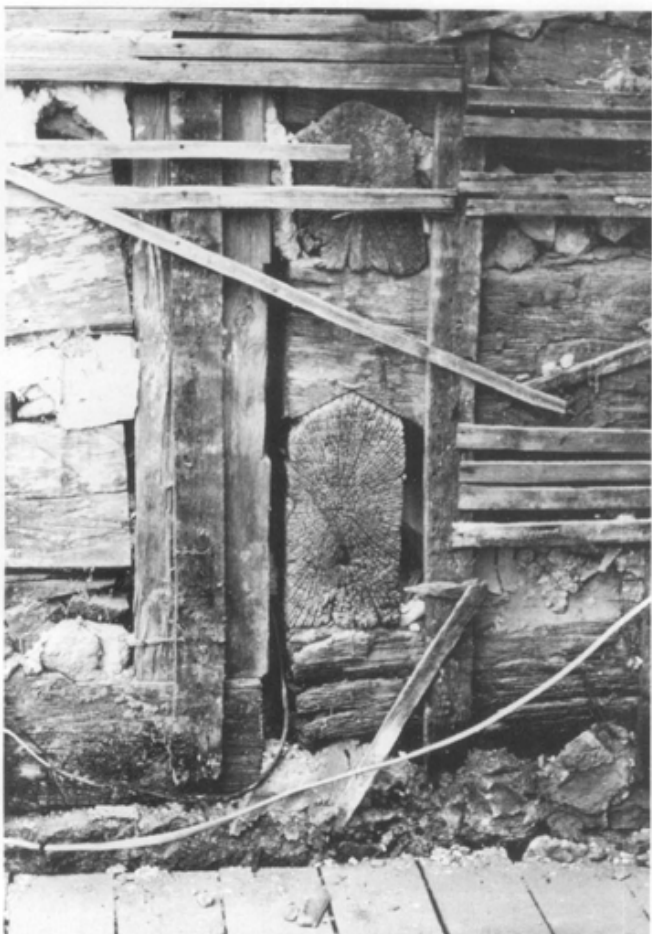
Removal of deteriorated stucco in preparation for stucco repair on this late-18th century log house in Middleway, West Virginia, reveals that the stucco was applied to hand-riven wood lath nailed over vertical wood strips attached to the logs. Photo: Anne Grimmer.
